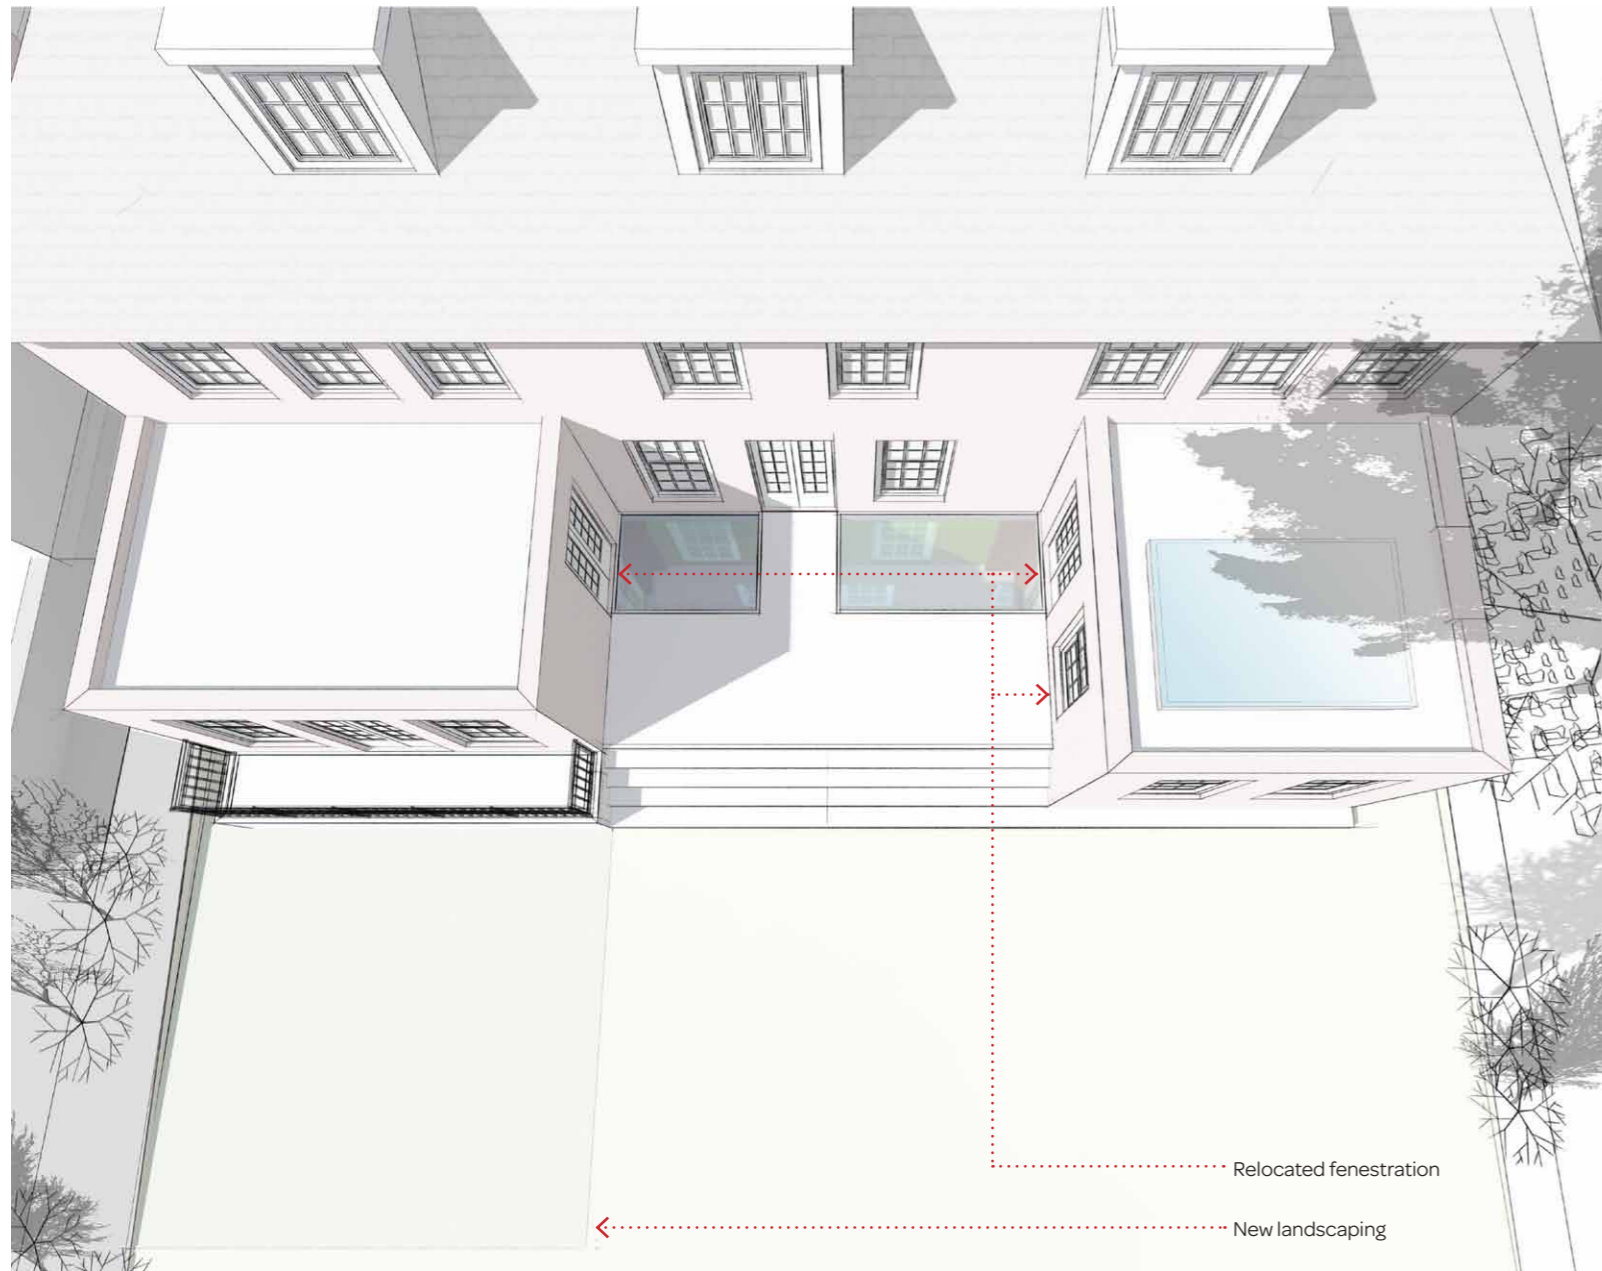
Proposed base riser to line through w/ rear balcony elevation.
